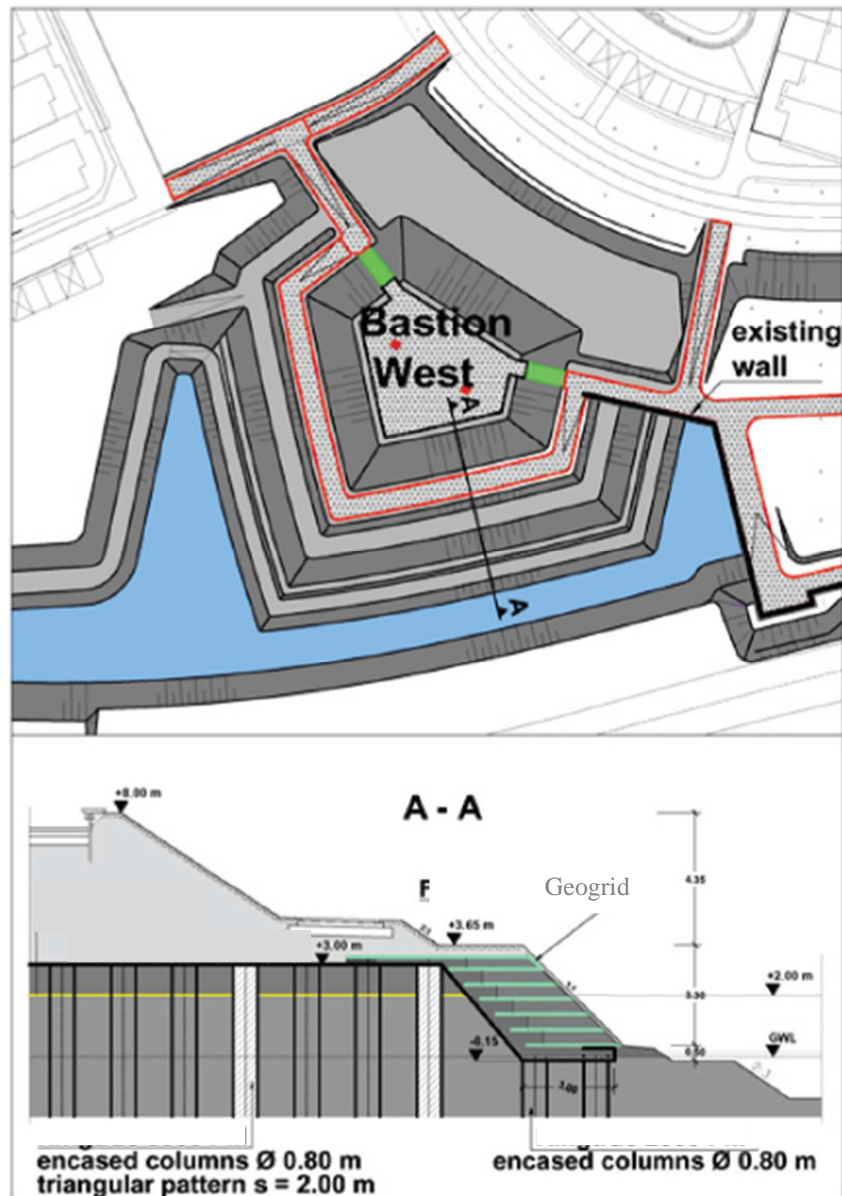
Plan and elevation views of Bastion West showing the location of the GECs beneath the reinforced soil slope after Brokemper et al. (2006)
